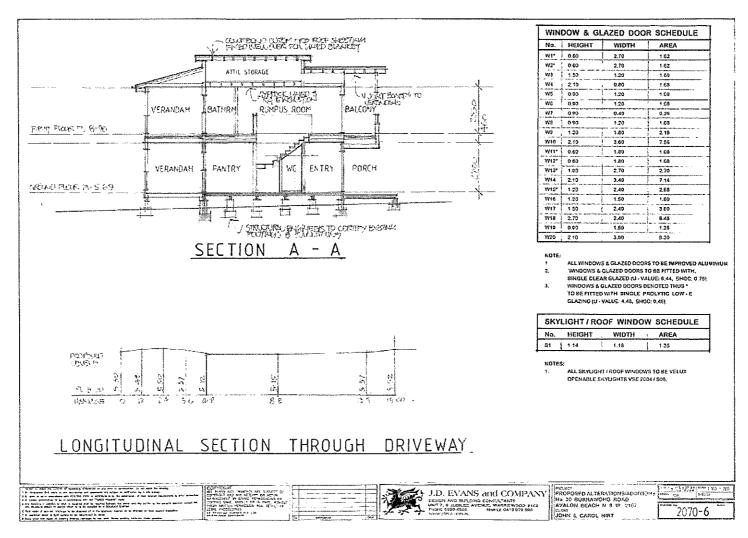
Pages 11 to 16 Floor Plans, Elevations & Sections.
